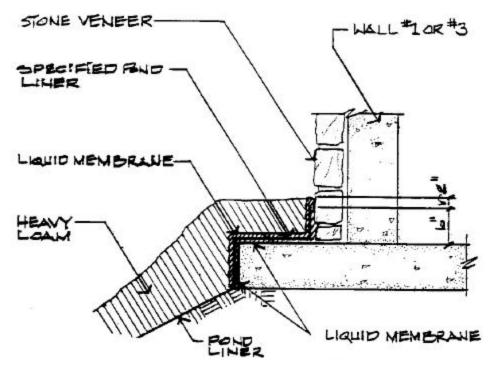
Pond Liner Attached to Exterior of Rock Wall (Courtesy COA)
